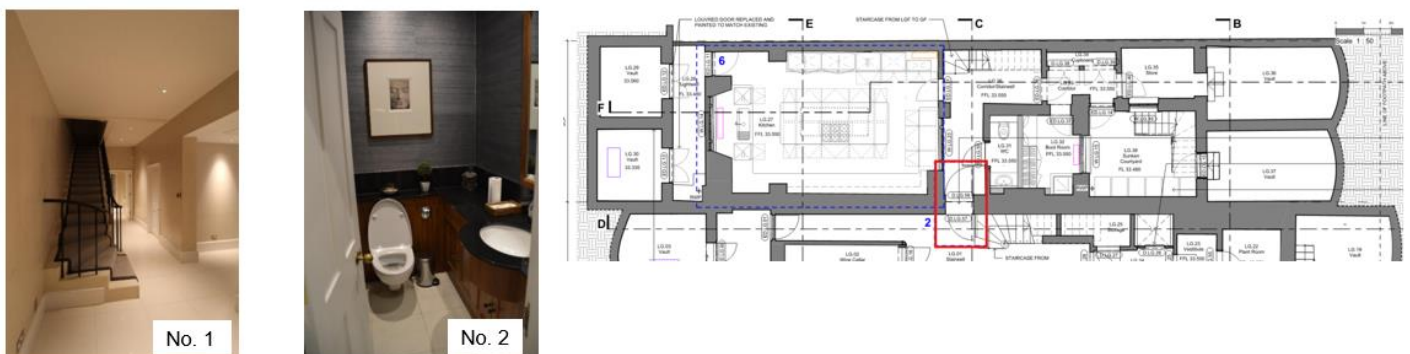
Extract from proposed lower ground floor plan showing lateral connection between no. 1 and no. 2 (above in red) and photo of location of opening between no. 1 and no. 2 (left)
